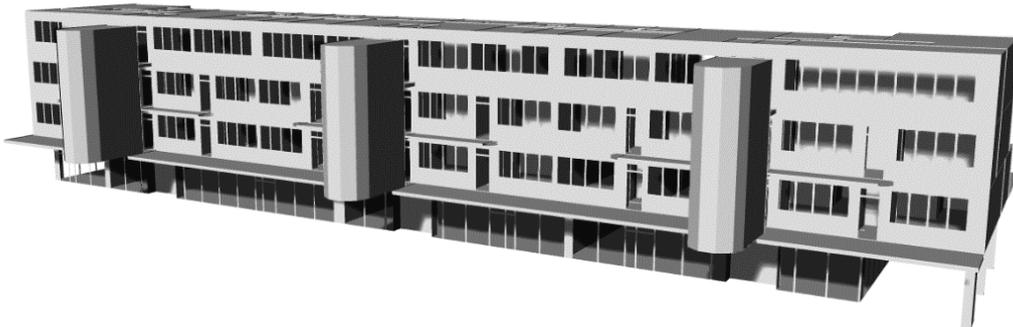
East façade, Building A5, Reigersbos, Amsterdam (Source: TUDELFT)
